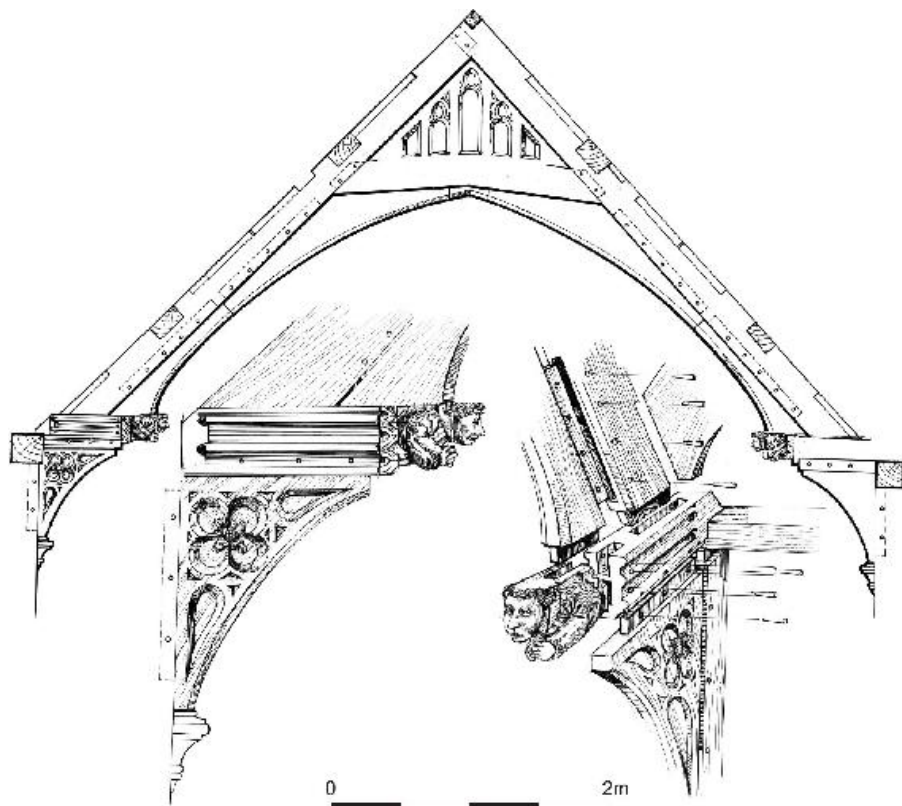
A hammer-beam truss in the roof of the Booth Hall, with reconstructions of the brace and hammer-beam detailing and assembly
